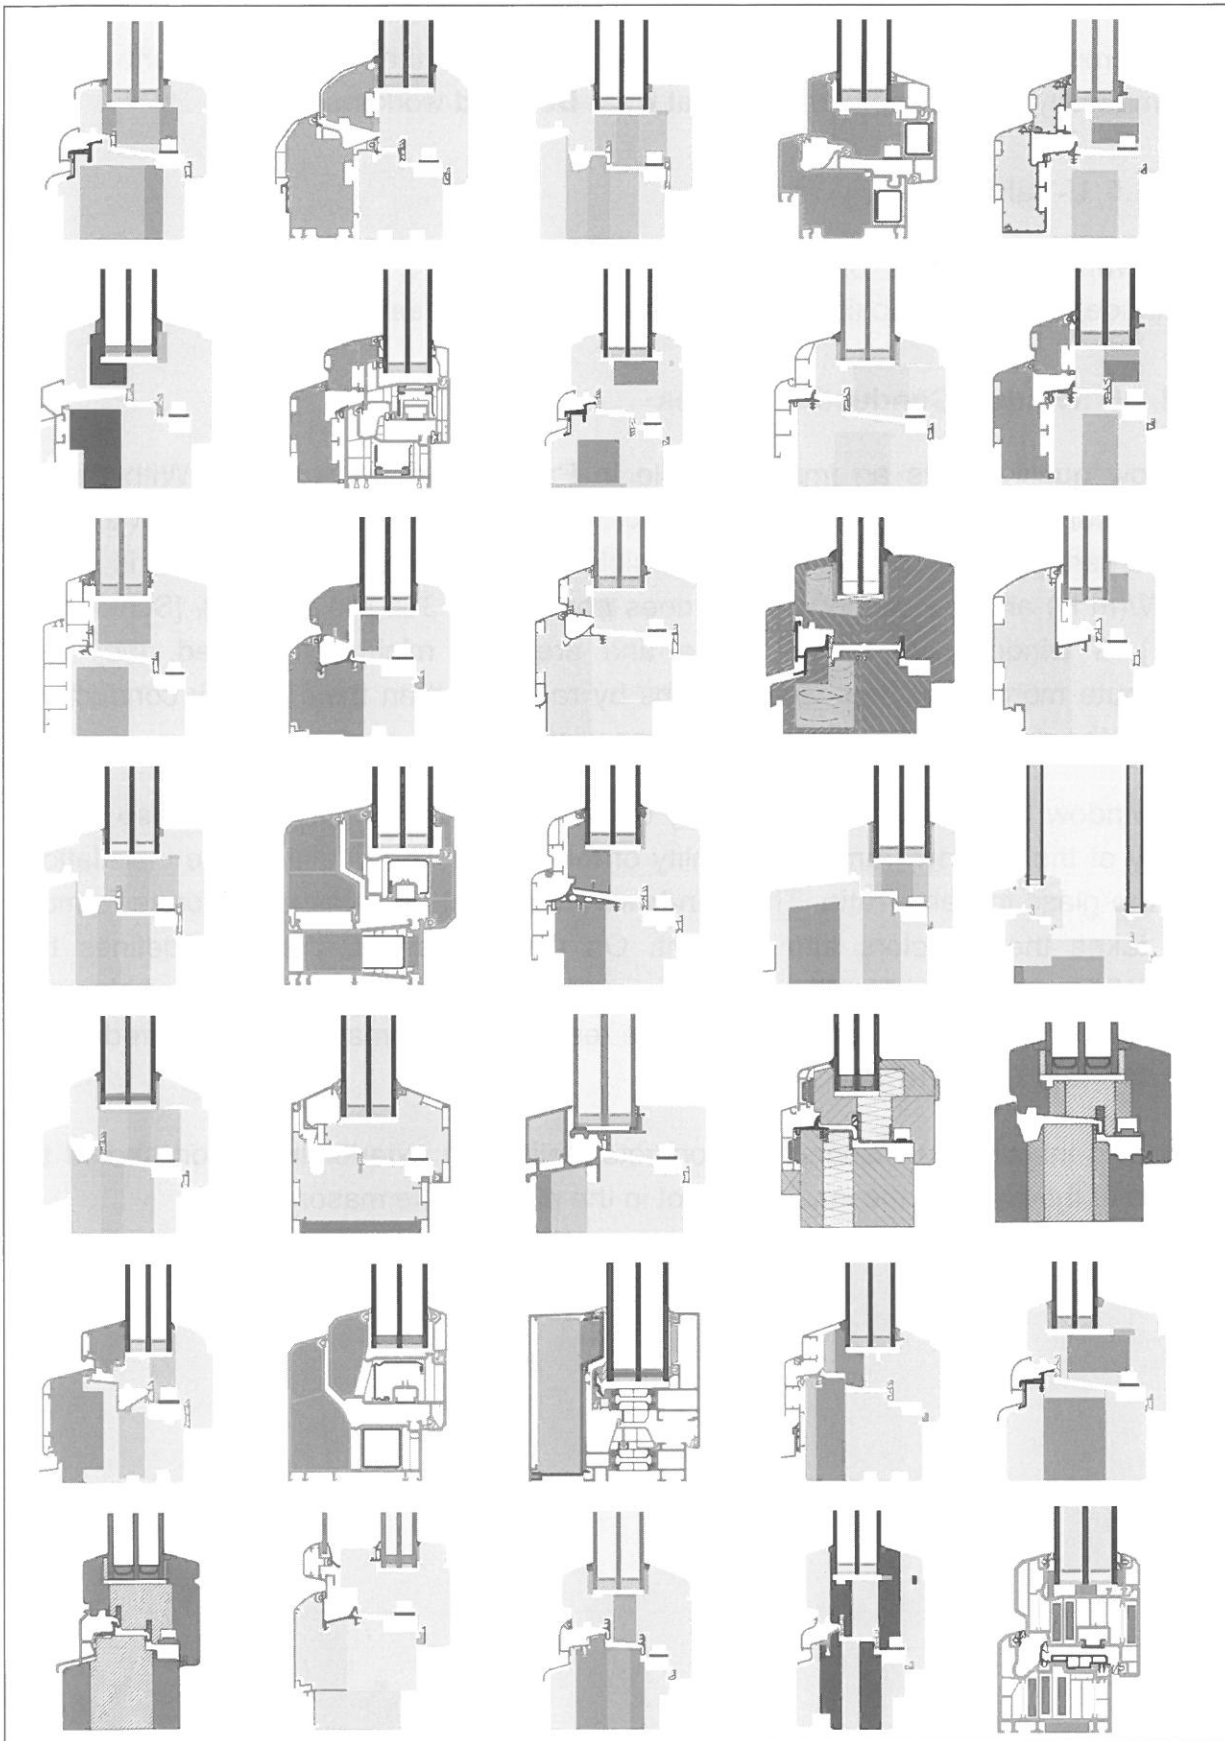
Some of the windows certified by the PHI as suitable for Passive Houses (all certified windows can be found at [www.passiv.de](http://www.passiv.de)).
